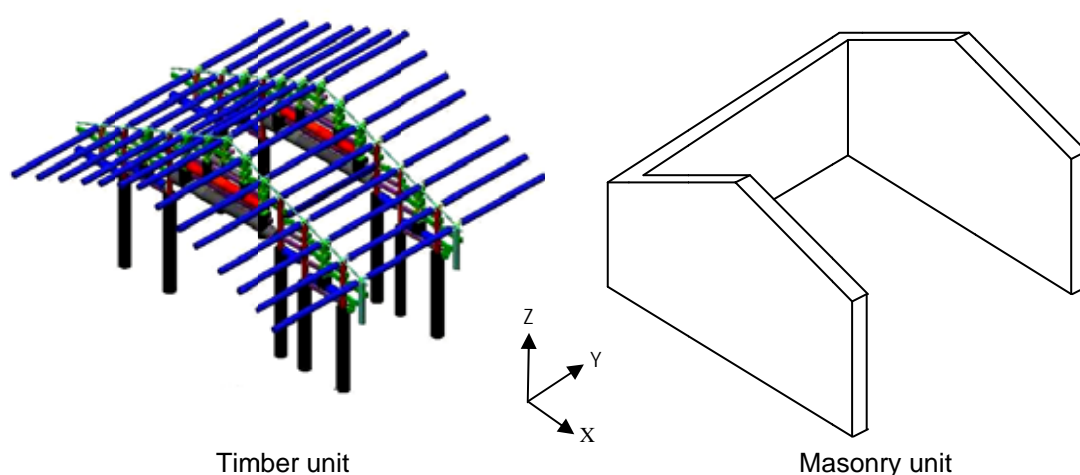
Timber and masonry constructions of Dieh-Dou building
